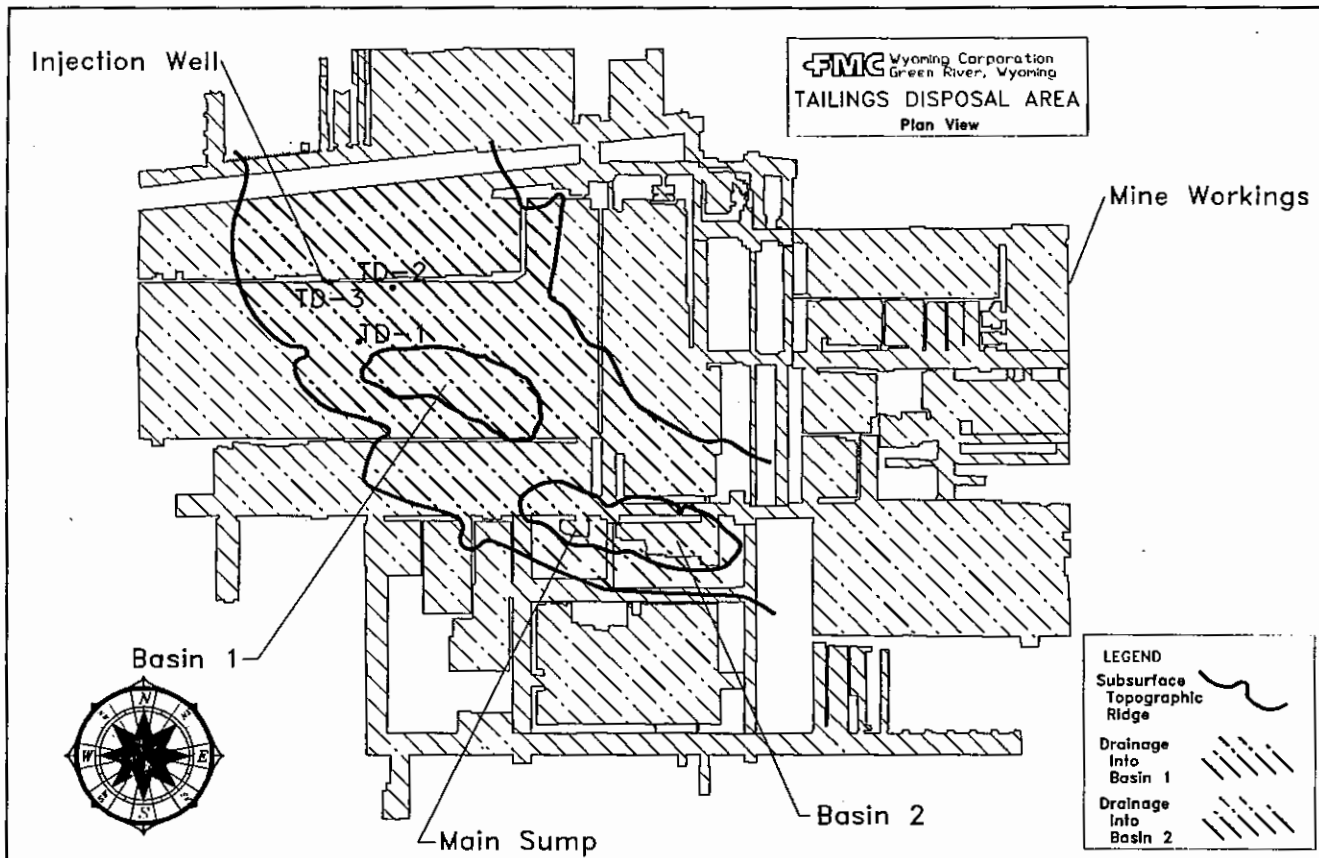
Plan view of underground mine showing anticlinal structure with ridges and basins.
